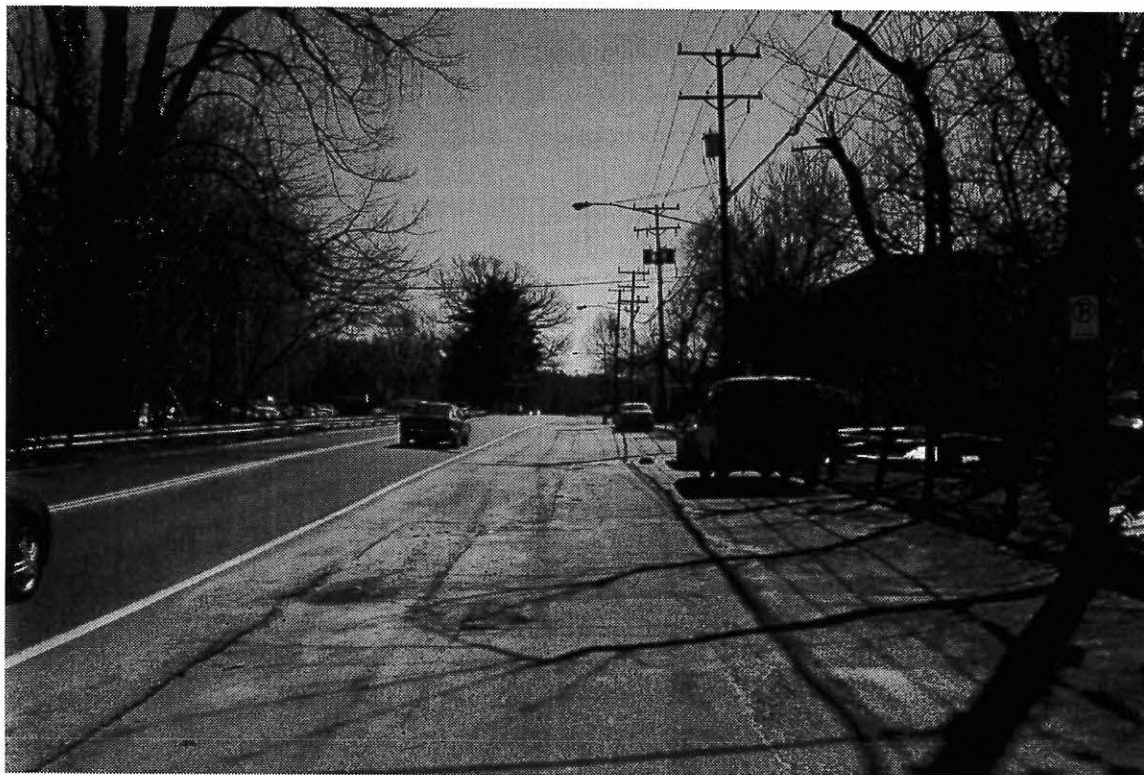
MacArthur Boulevard at Windward Place Looking Eastbound
